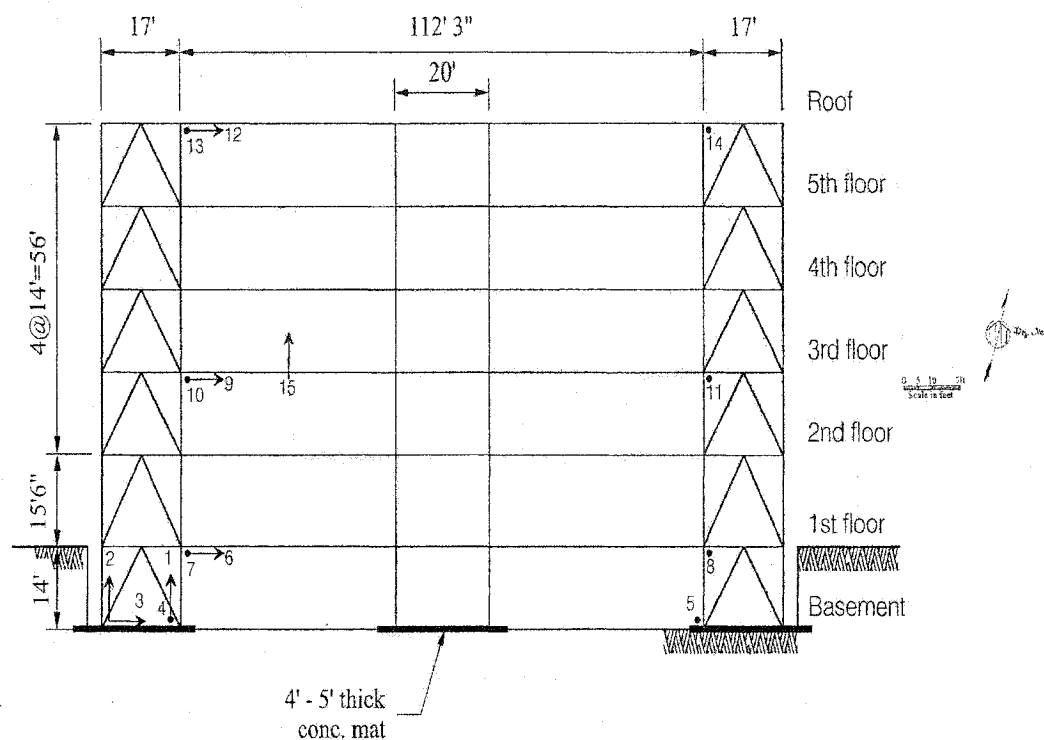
Elevation - Sensor Location (3. Hao, A9.1.6)
